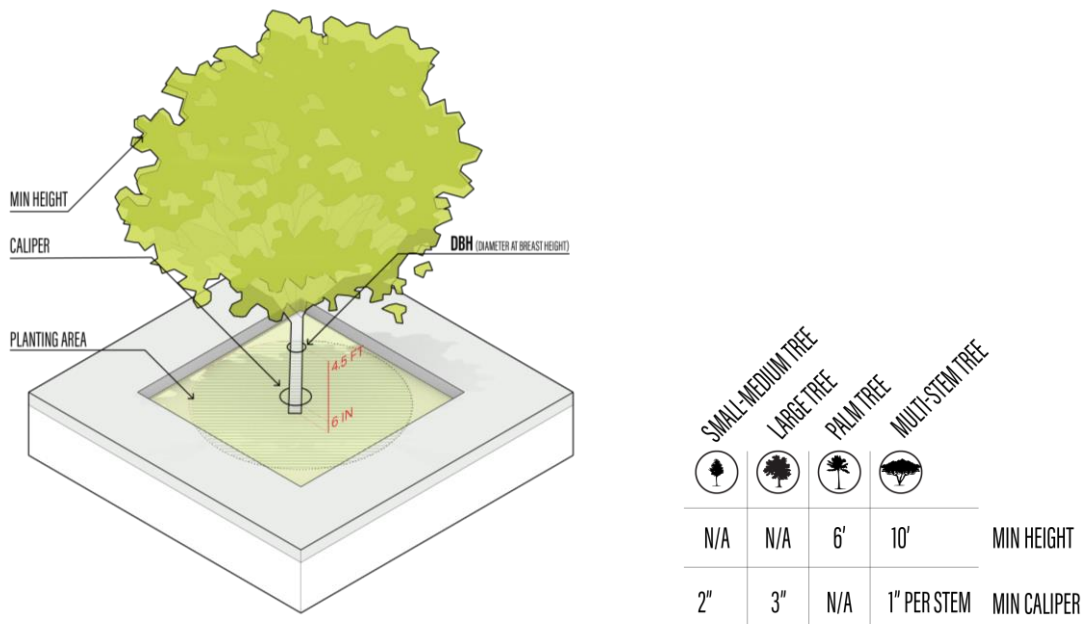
Minimum Planting Dimensions and Planting Area
